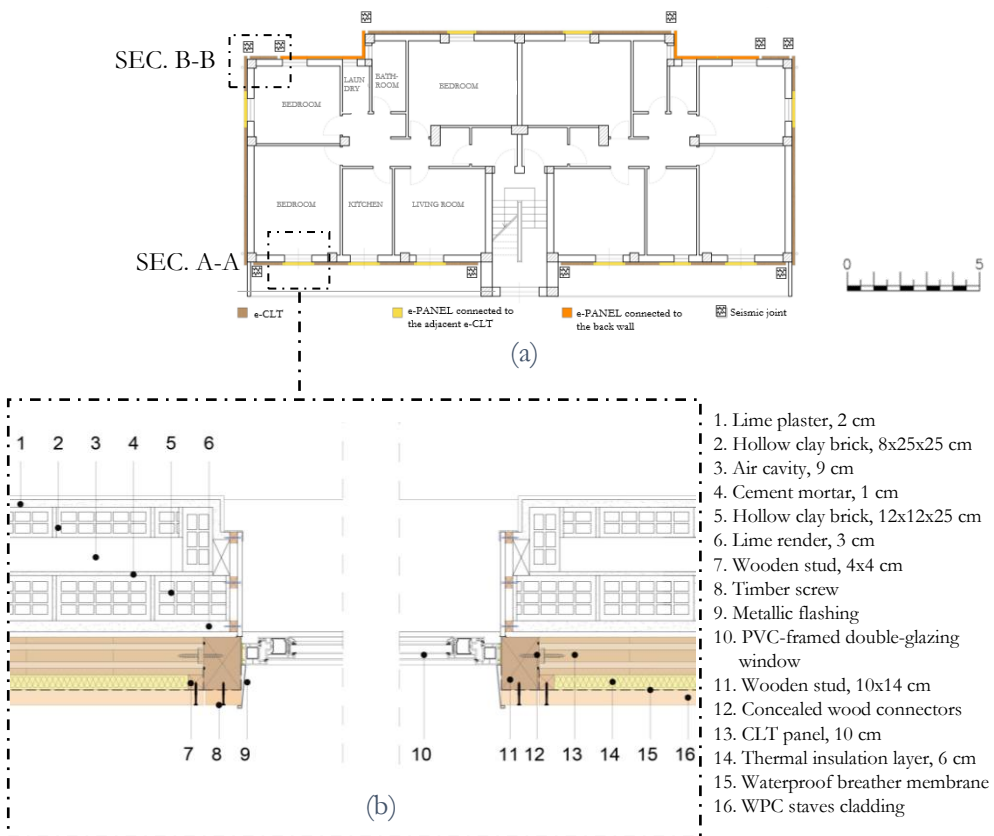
(a) Ground floor plan of the case study after the application of e-CLTs and e-PANELs and (b) section A-A (scale 1:20).
